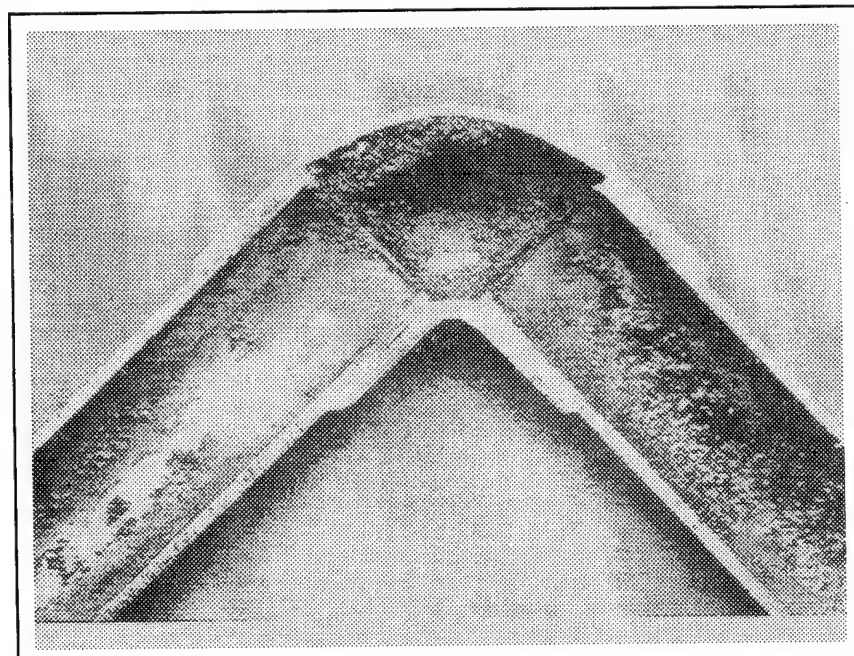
Copper tube showing workmanship defects, i.e., unreamed tube ends, solder globs, and excess solder flux
